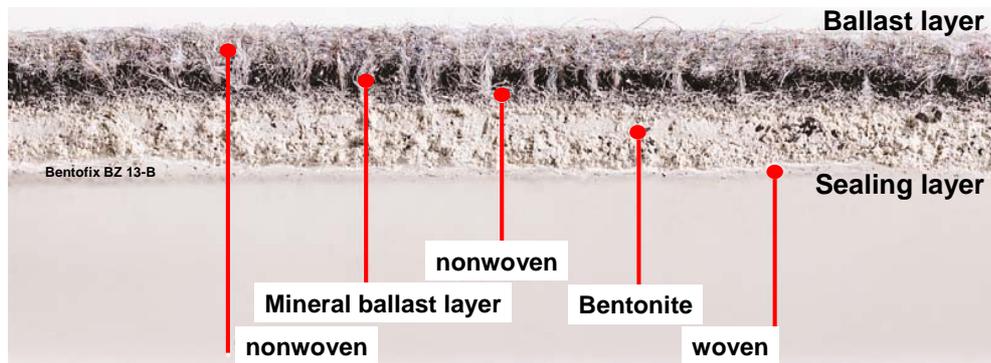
Cross-section of a heavy geosynthetic composite made from a sand mat and a GCL for underwater installation and as stable liner against wave loads (Heerten et al, 2008)
